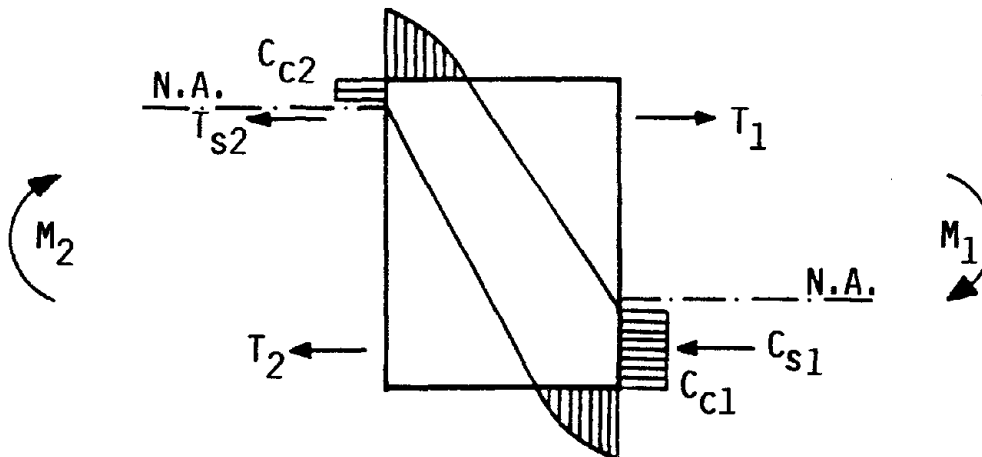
(b) Diagonal Compression Strut in Interior Joint with Floor Slab
